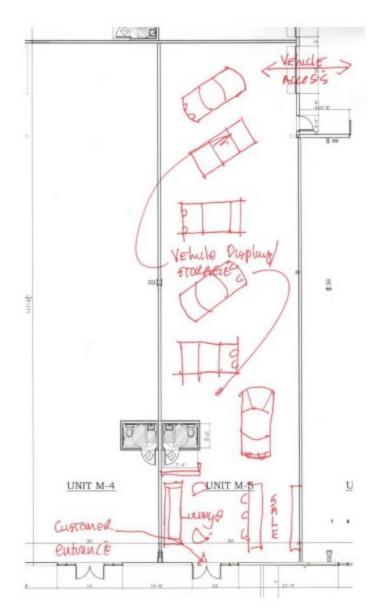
Proposed Floor Plan Source: Applicant's Neighborhood Meeting PowerPoint
